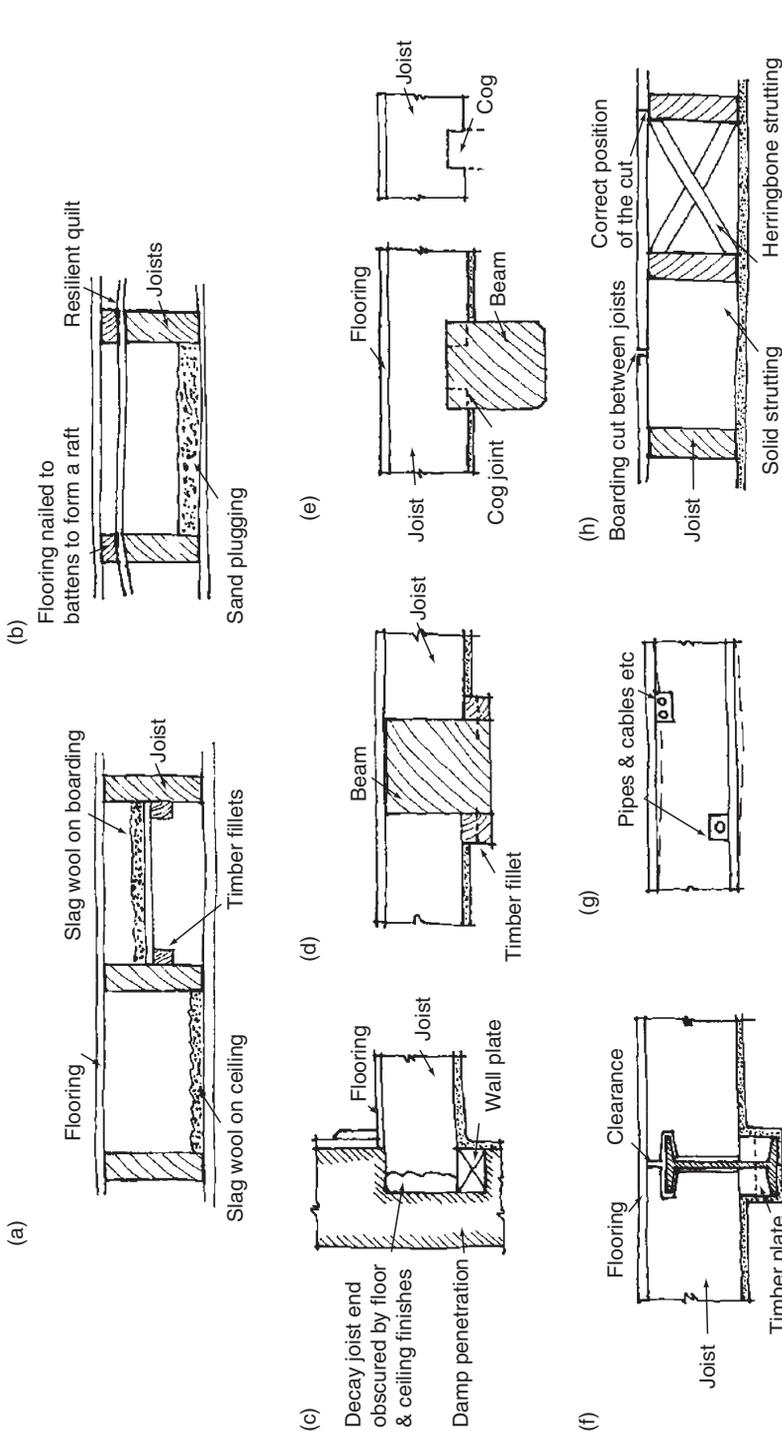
(a) Two methods of sound insulation between floors. (b) 'Floating floor' for sound insulation. (c) Joists built into solid wall without an air space. (d) Joist resting on fillets nailed to bottom edge of beam. (e) Method of cogging joists over timber beam. (f) Typical notching when RSJs are used. (g) Floorboard jointing and strutting details. (h) Floorboard jointing and strutting details
